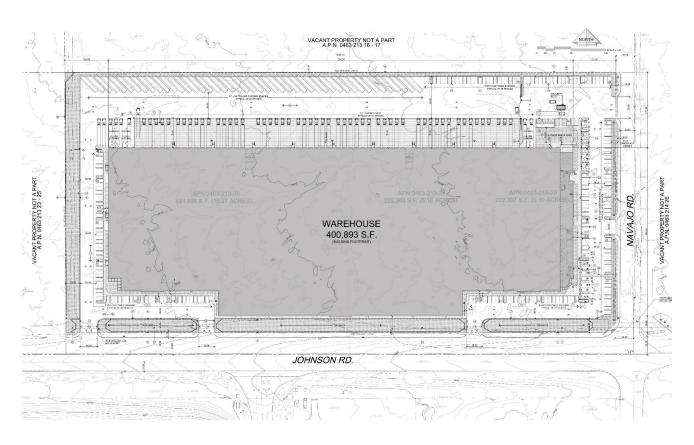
SITE PLAN SOURCE: STEENO DESIGN STUDIO, INC
